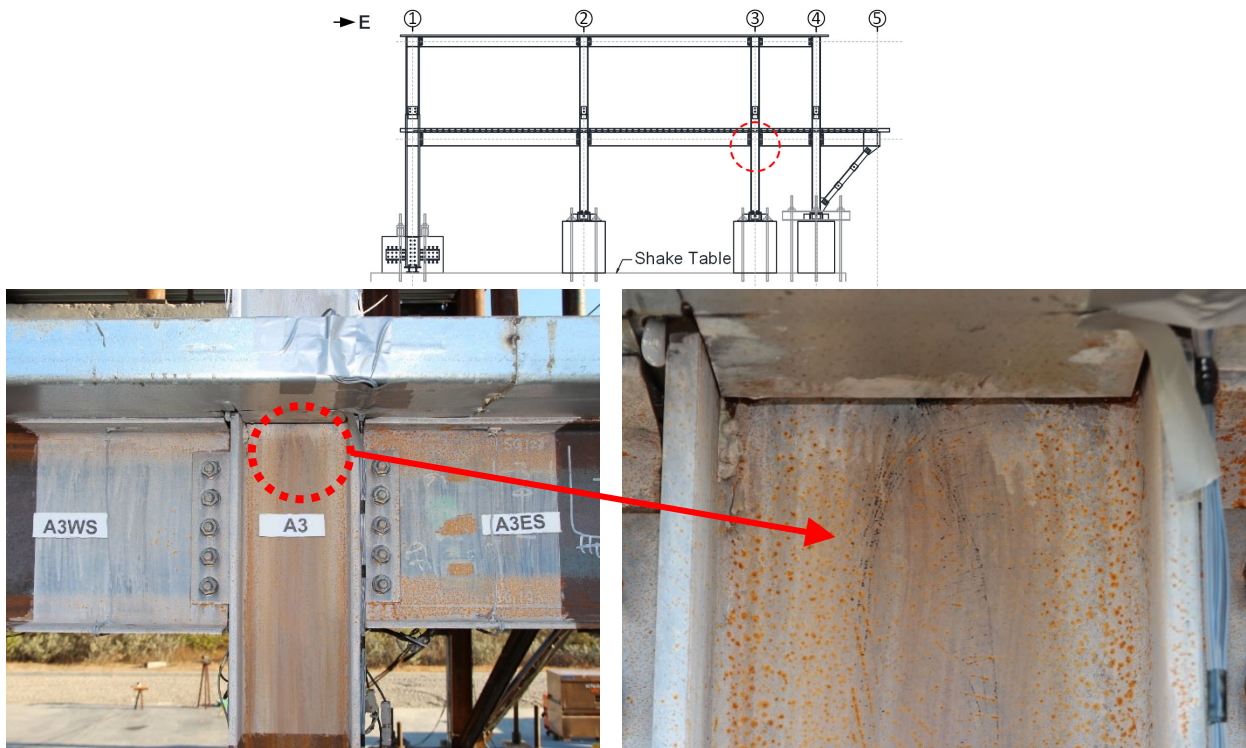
After Test 2B-3: Minor Flaking of Whitewash in Column Panel Zone of 2<sup>nd</sup> Floor BW Connections
